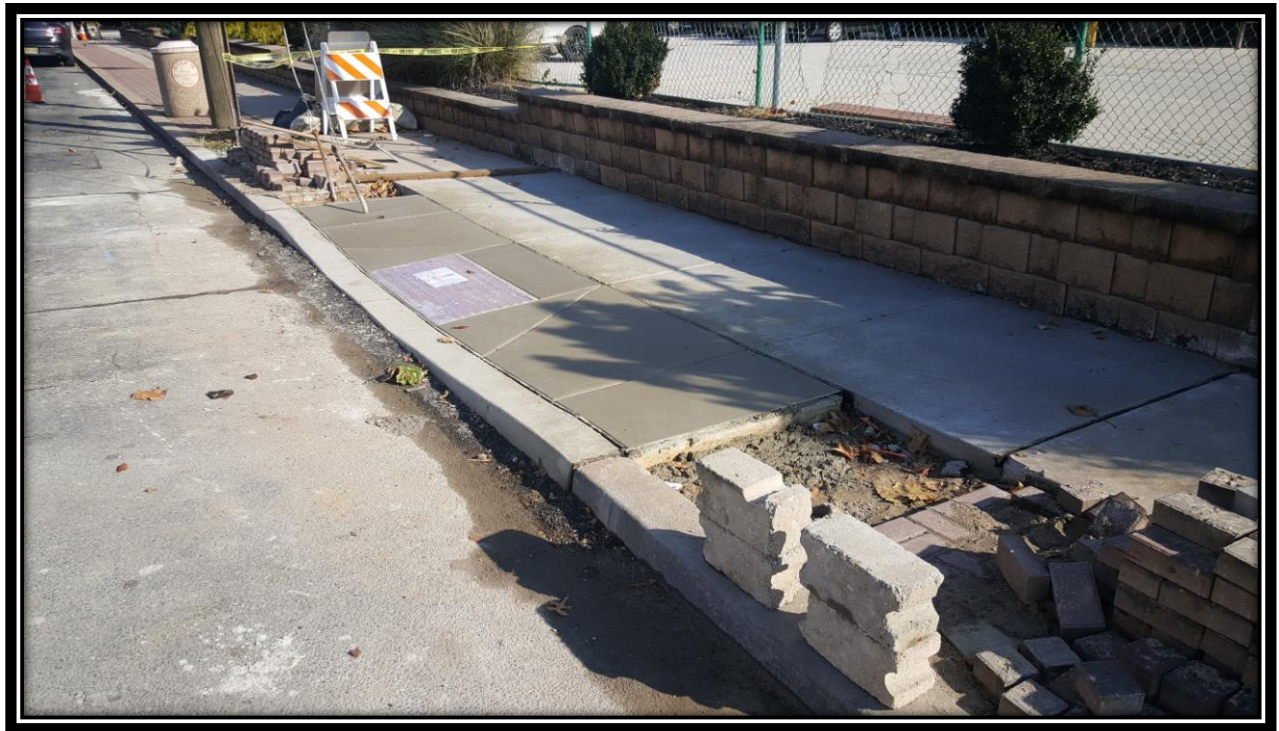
Installation of midblock ADA ramp between 48th Street and 49th Street along the eastbound lane
